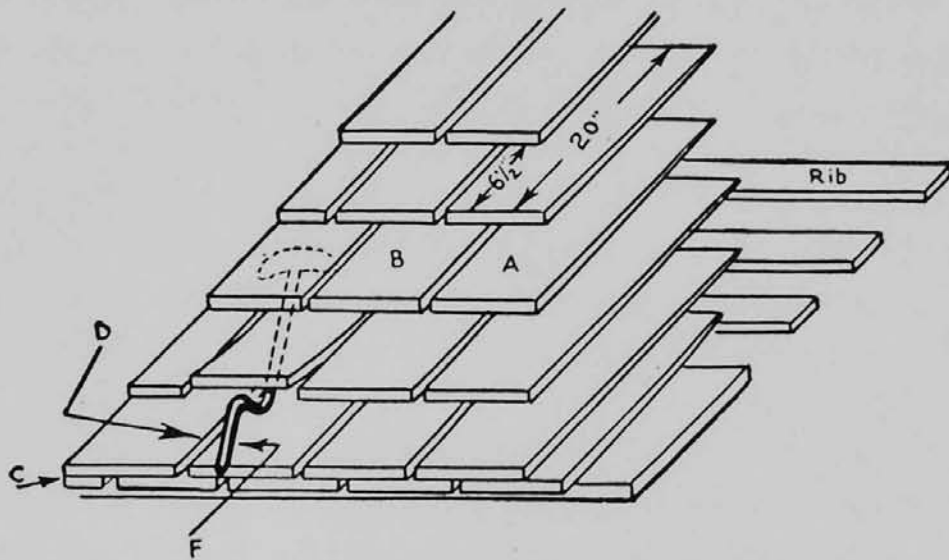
Arrangement of shingles and use of shingle hook.
